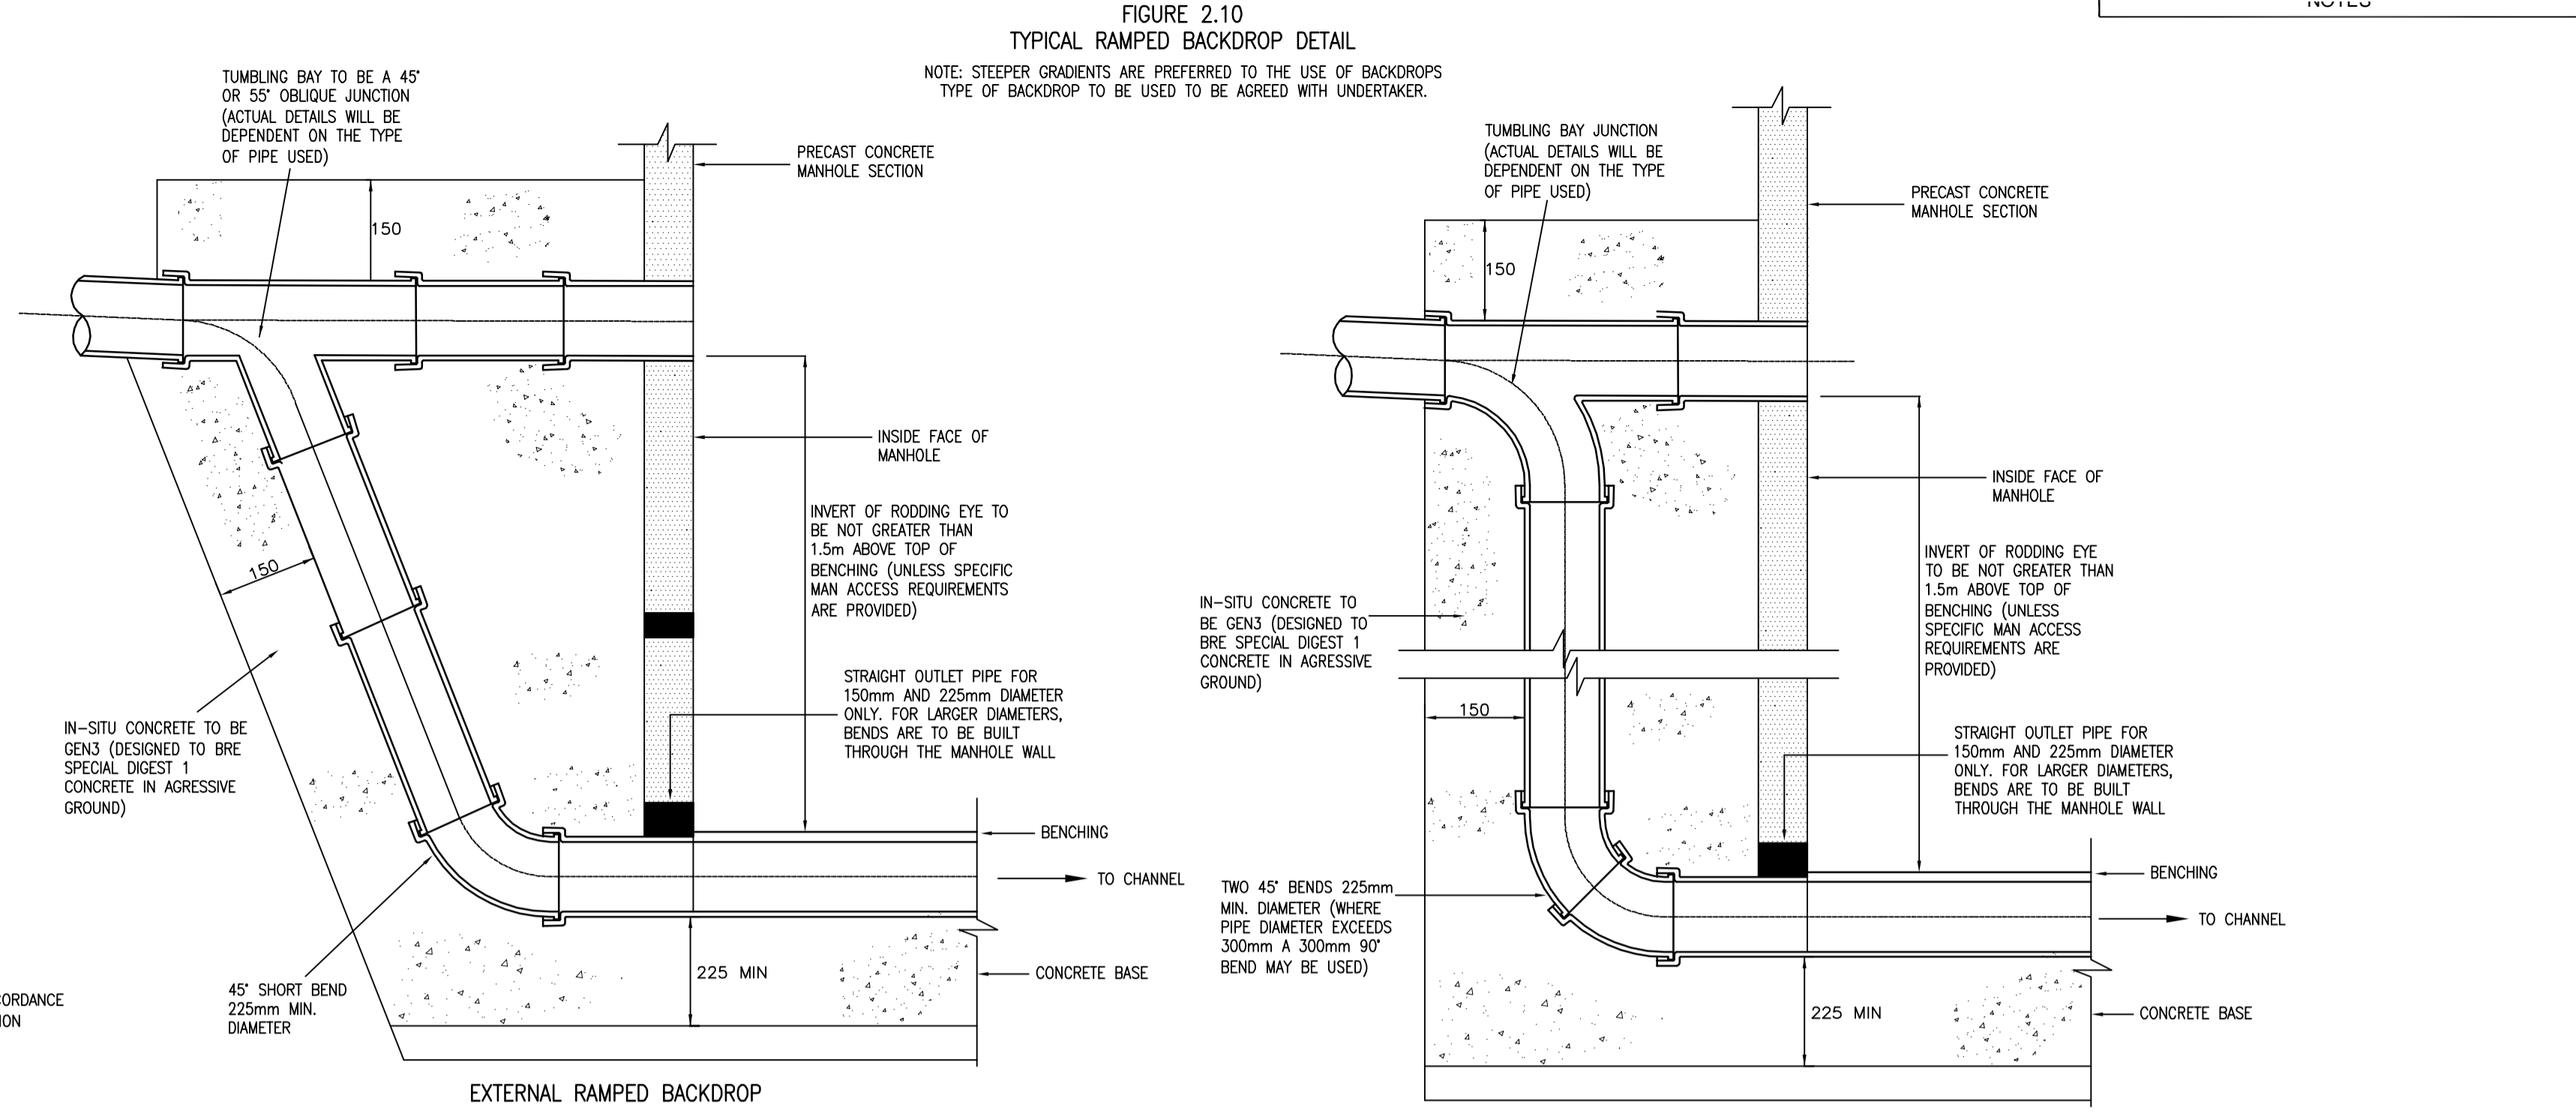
TYPICAL RAMPED BACKDROP DETAIL
